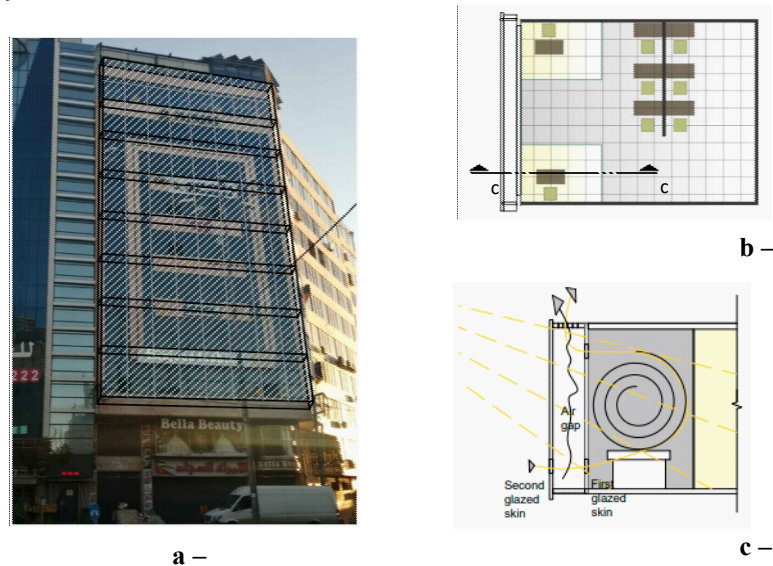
a – The proposed 2nd glazed façade for the west-oriented Zuwwar tower, in which the new façade kept the desired transparent appearance. b – A plan illustration of the proposed second glazed façade for the west-oriented Zuwwar tower. c – Section c-c shows the double-glazed façade with a ventilated air gap
